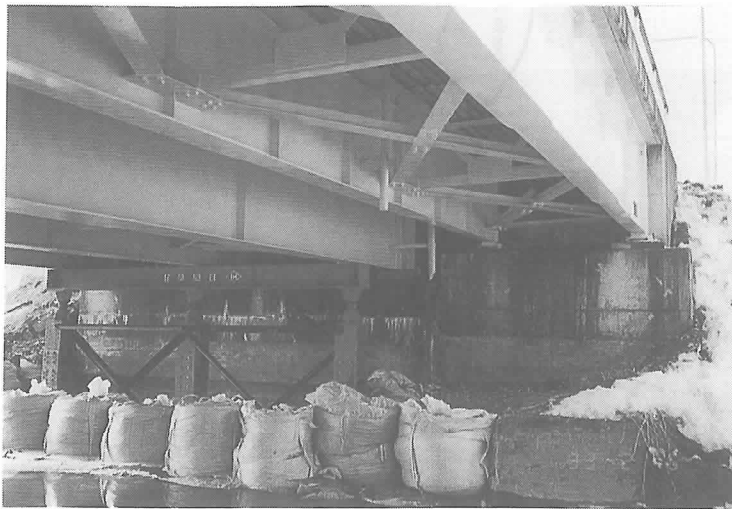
Movement of the abutment pier and shore protection (compound beam bridge, constructed in 1966)
